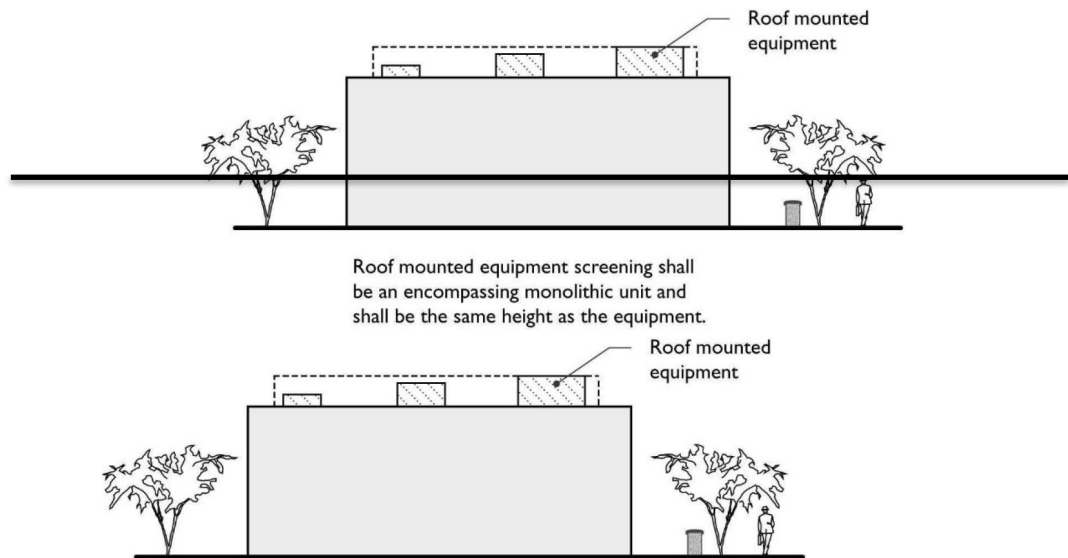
A.(1): SCREENING OF ROOF-MOUNTED EQUIPMENT
